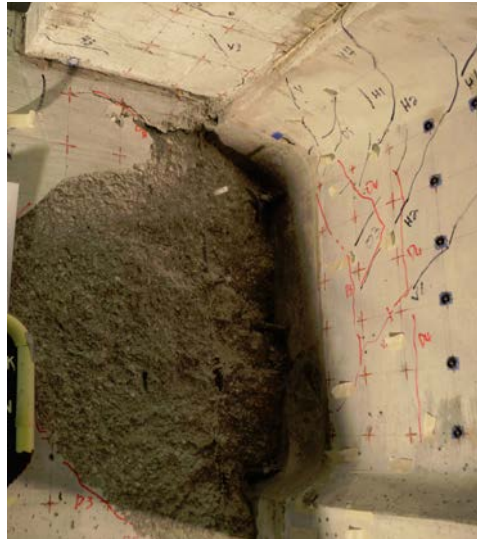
Spalling of cap cover concrete adjacent to girder
